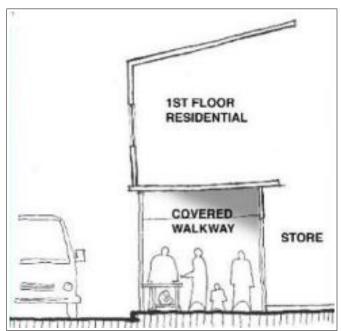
Section Illustrating Two Storey Unit with Ground Level Retail and Trade Out onto Covered Pavement (Luckan, 2016)
